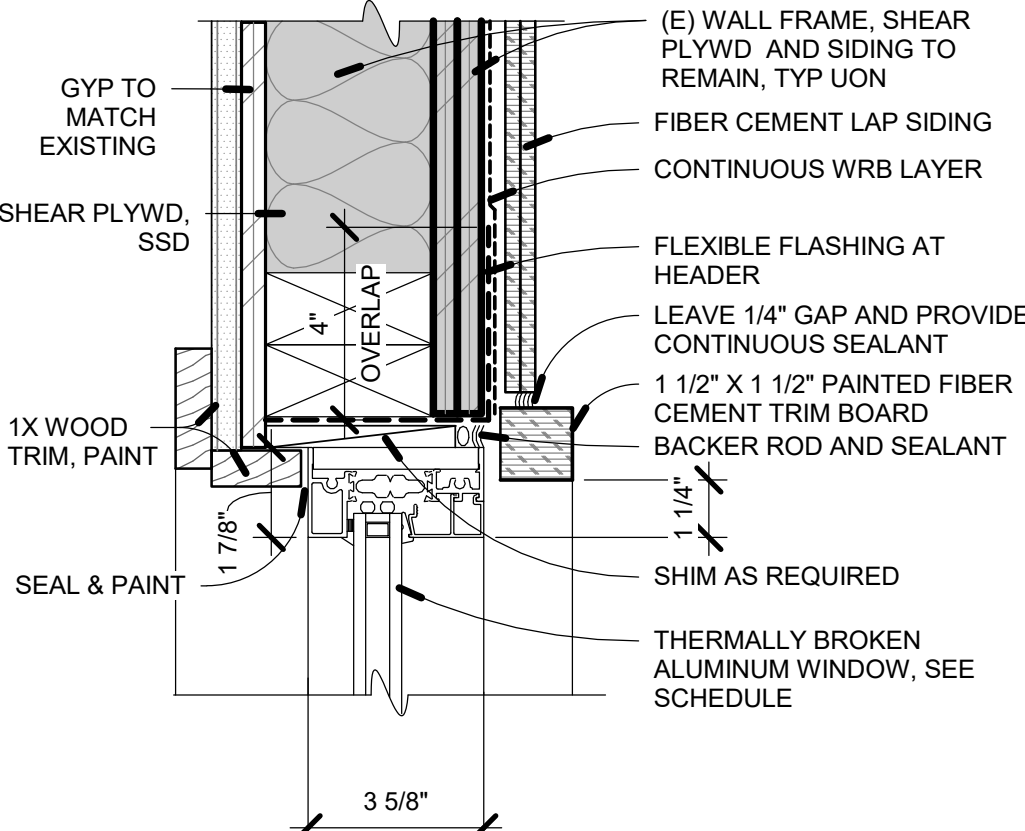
DETAIL APPLIES TO ALL WALL PENETRATIONS: WINDOWS, DOORS, LOUVERS, ACCESS PANELS AND SIMILAR ITEMS.
